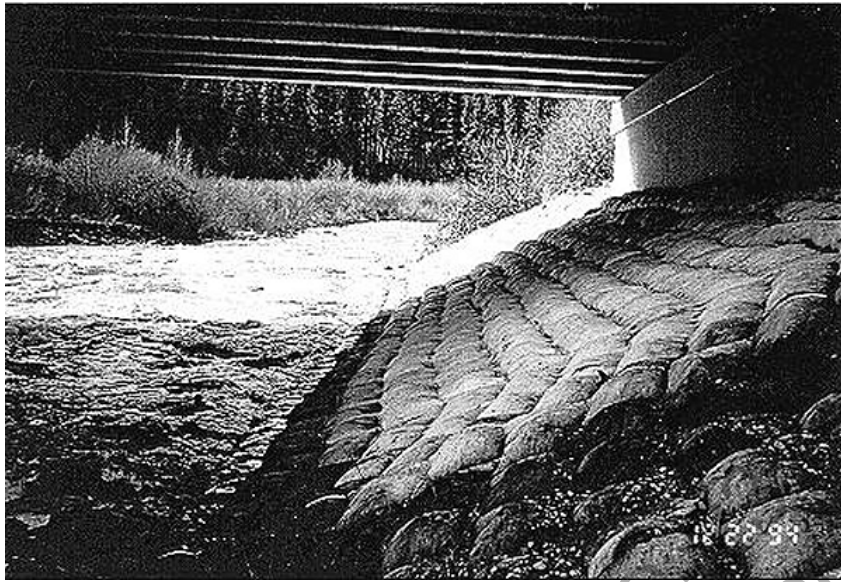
ABM underneath Salmon Creek Bridge (ODOT).⁽⁶⁾
